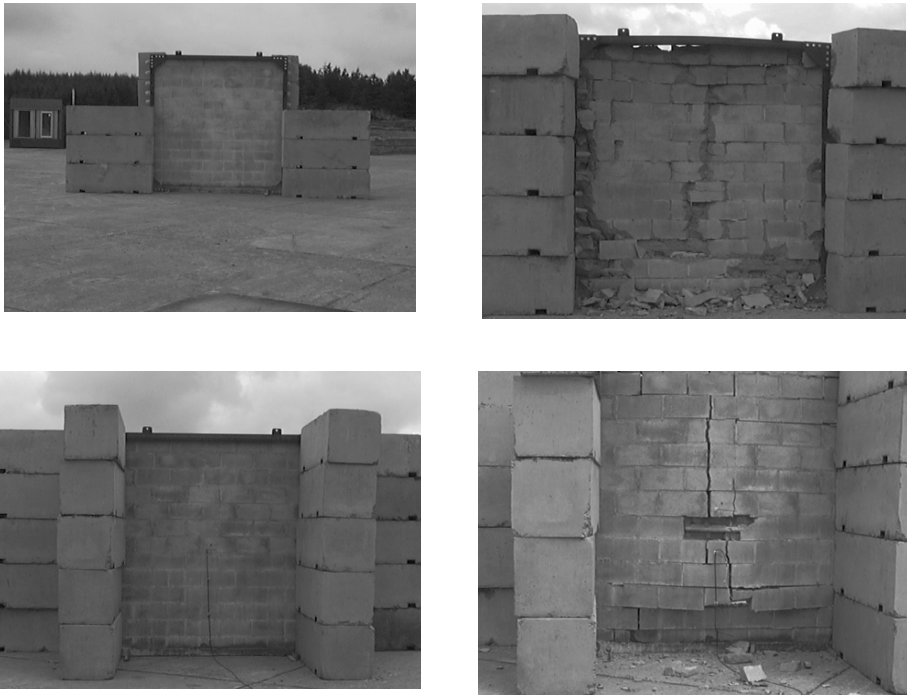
Before (*left* column) and after (*right* column) views of the Spadeadam Wall Test in June 2001. The wall was subjected to a blast load from 200 kg TNT NEQ @ 12.5 m; 534 kPa, 1,274 kPa ms (440 lbs TNT NEQ @ 41 ft; 77 psi, 185 psi ms). The front view is at the top
